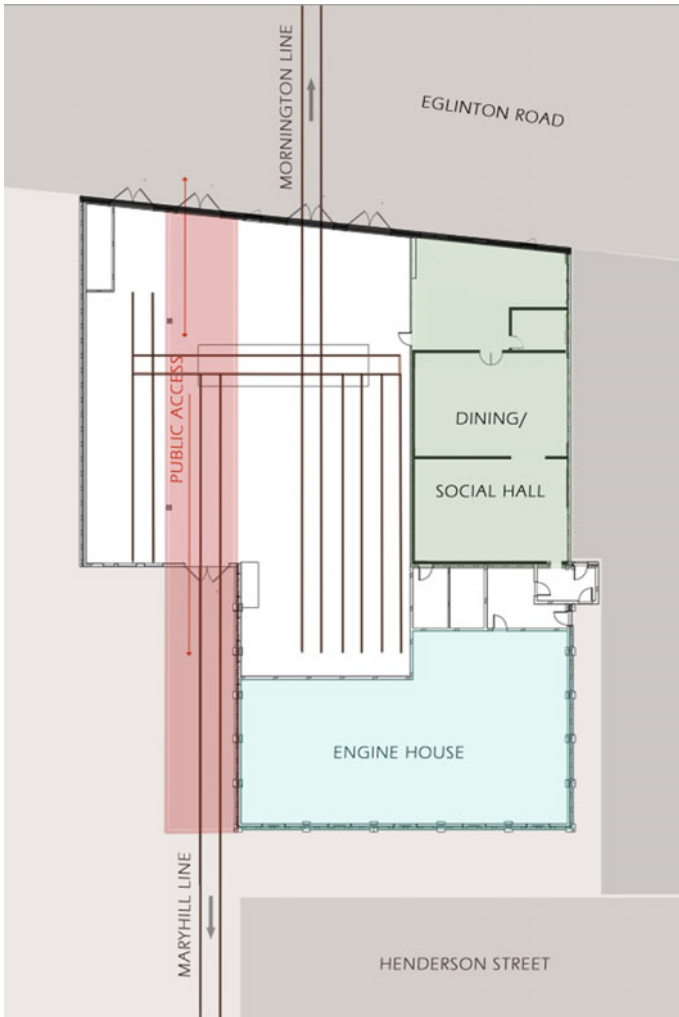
Mornington Cable-Car Depot floor plan—ground floor interior layout 1957. Original drawings from the Dunedin City Council Archives redrawn by Author
